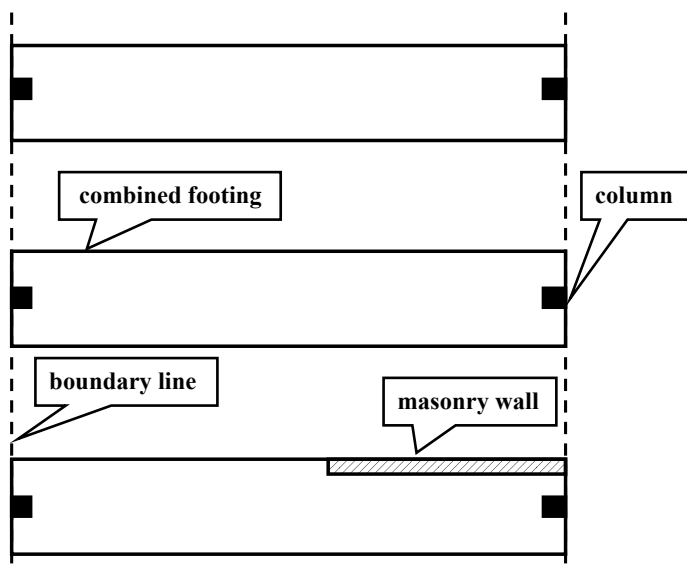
Part plan view of combined footings supporting two lines of boundary columns (from Dias 2008)
